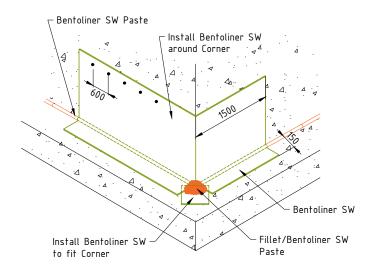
Start BentoLiner® SW at the corner horizontally. Place cut section at corner and apply Sealant at overlaps
